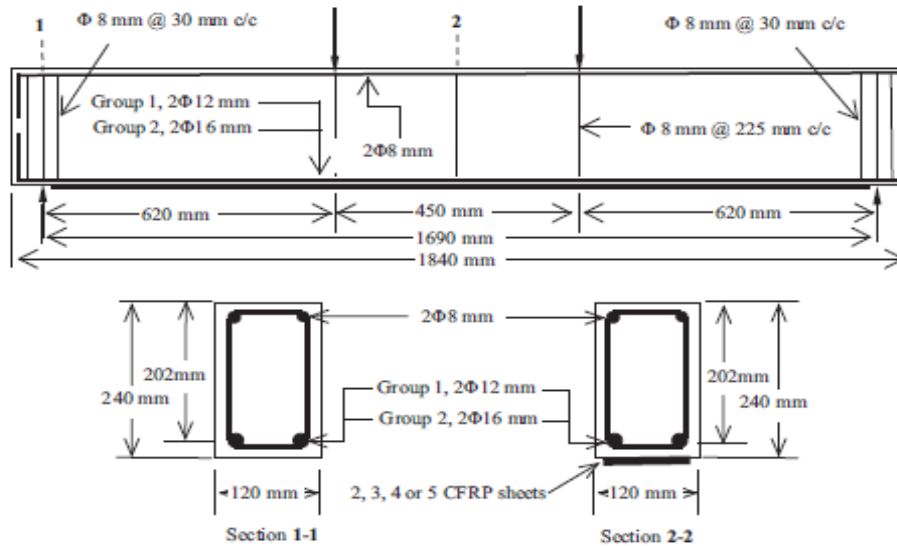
Details of concrete beams by CFRP. Hawileh et al. (2015)
